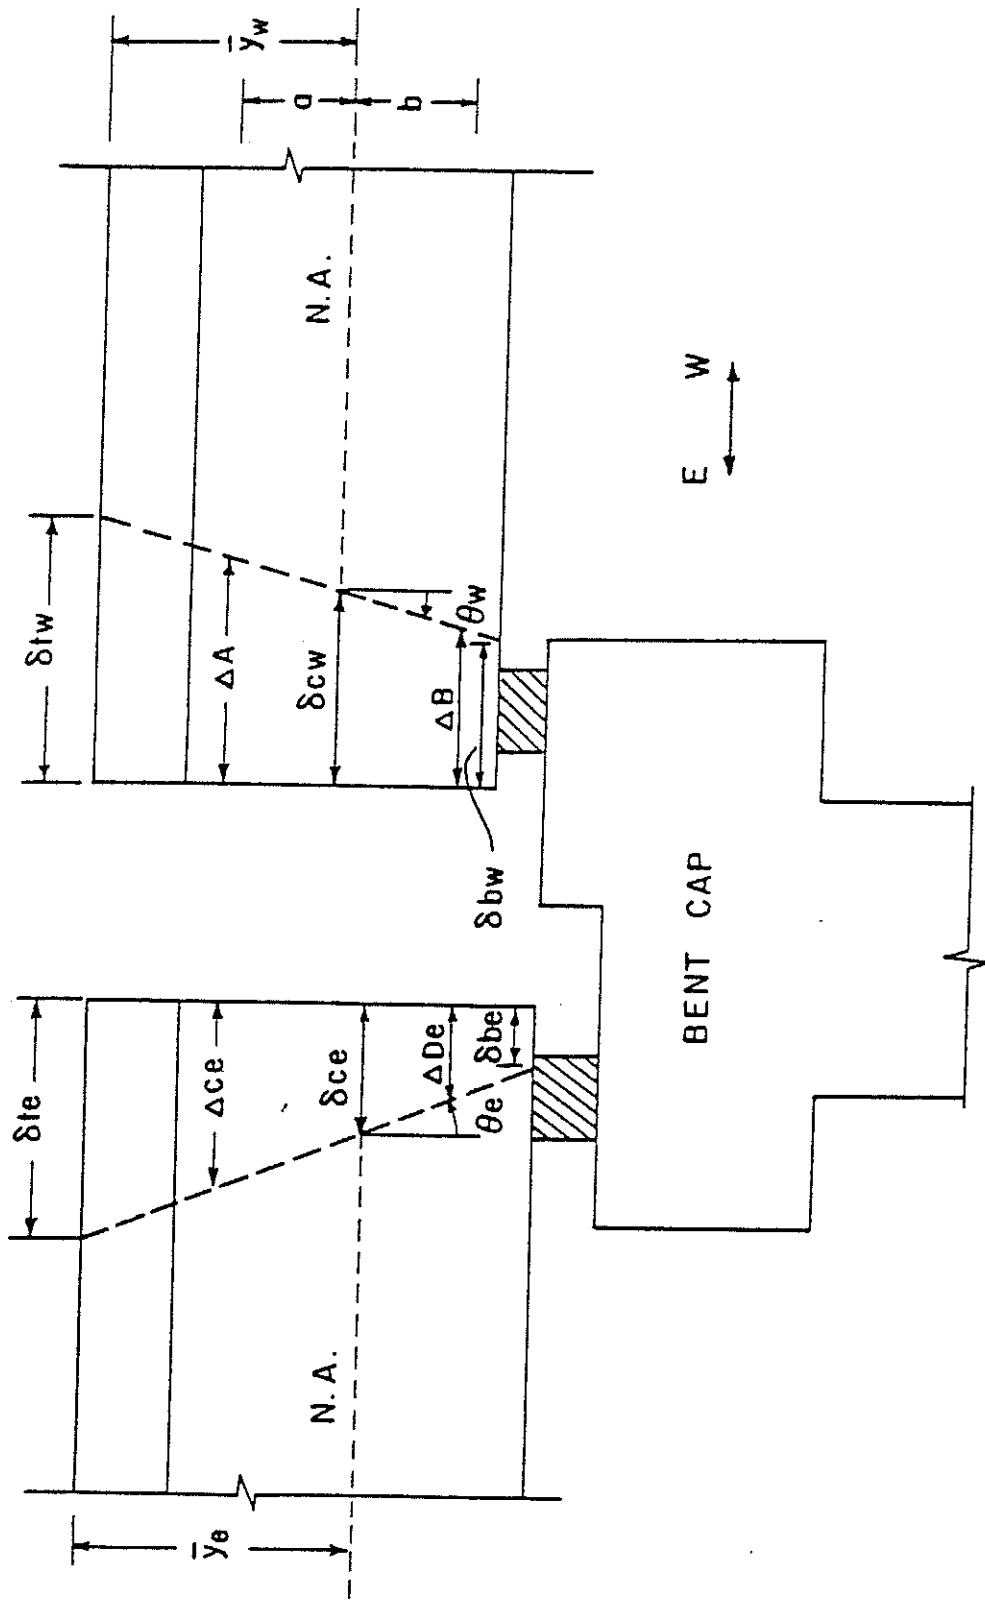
North Elevation of a Typical Expansion Joint, other than the Abutment, Showing Movements and LVDT Measurements Required to Calculate Movements.
